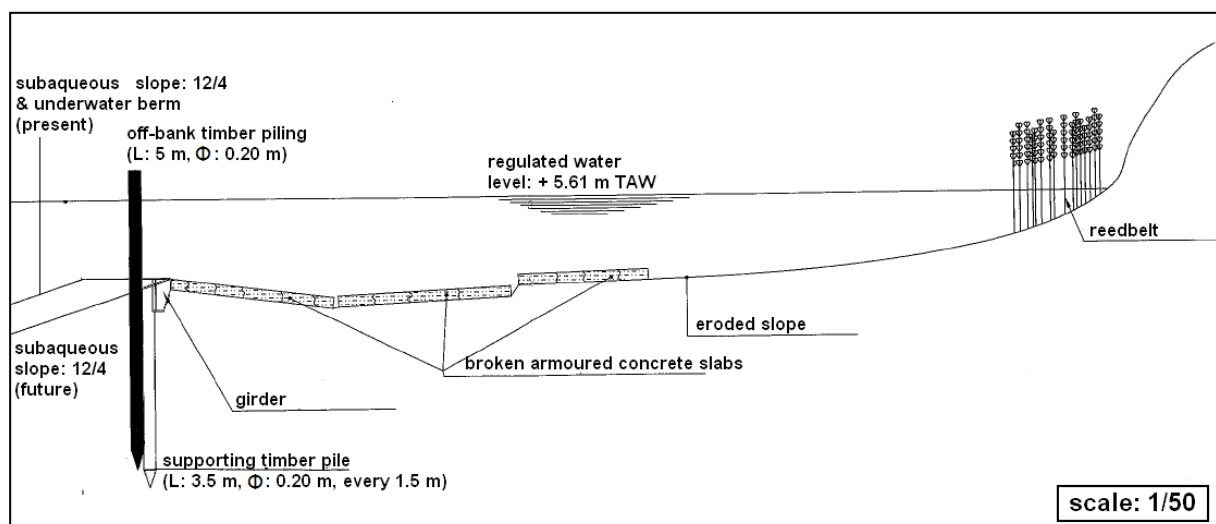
Cross section of the left bank at the measurement location: bank protection by means of off-bank timber piling in combination with (reed)vegetation (adapted from drafts of W&Z)
